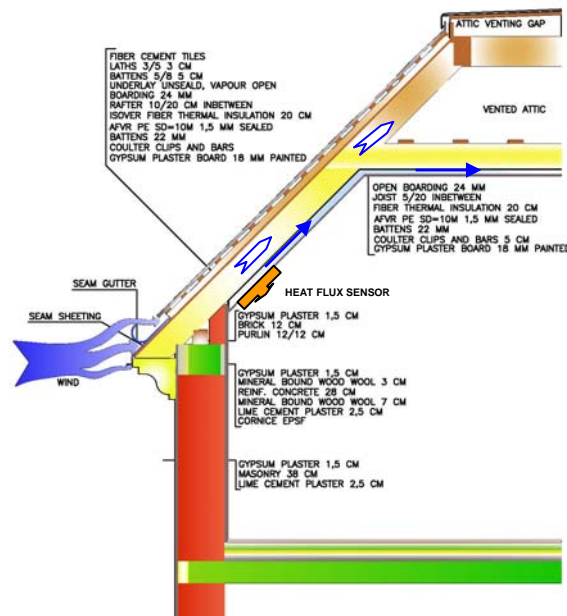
System Cross Section of a tested one family house – top floor; points of wind infiltration
